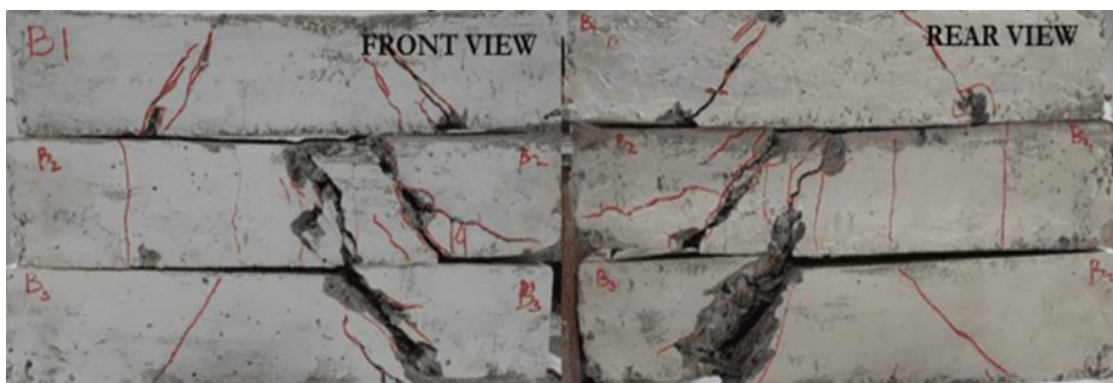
Crack patterns and failure model in the testing of three reinforced concrete beams, B1, B2, and B3
